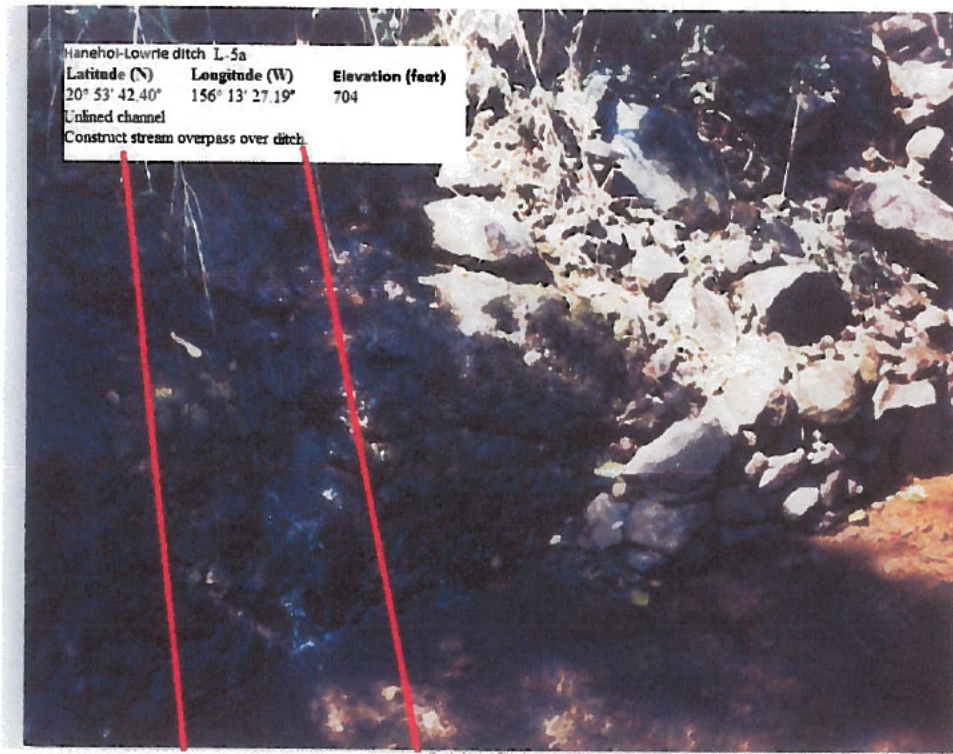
(above): East Hanehoi at Lowrie Ditch (L-5a)
